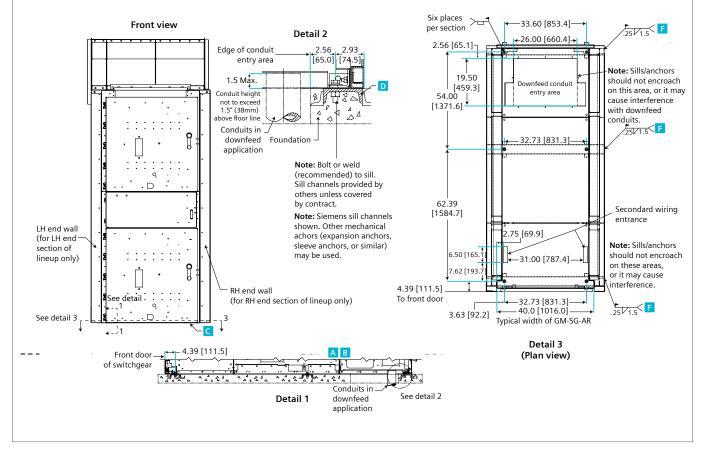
Anchoring indoor type GM-SG-AR switchgear rated up to 27kV
